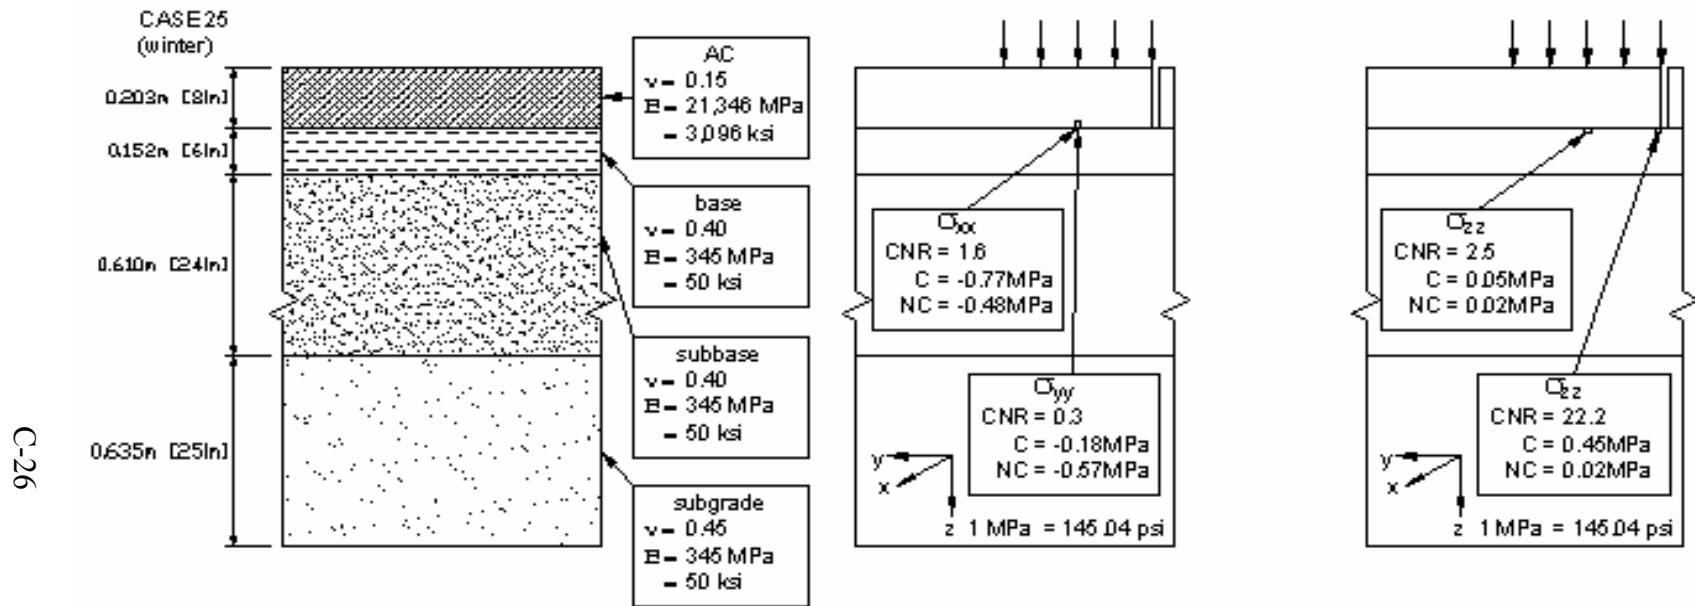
Summary cross section for case 25, (C – stress in cracked pavement, NC – stress in pavement with no crack, CNR – crack/no crack (stress) ratio)
